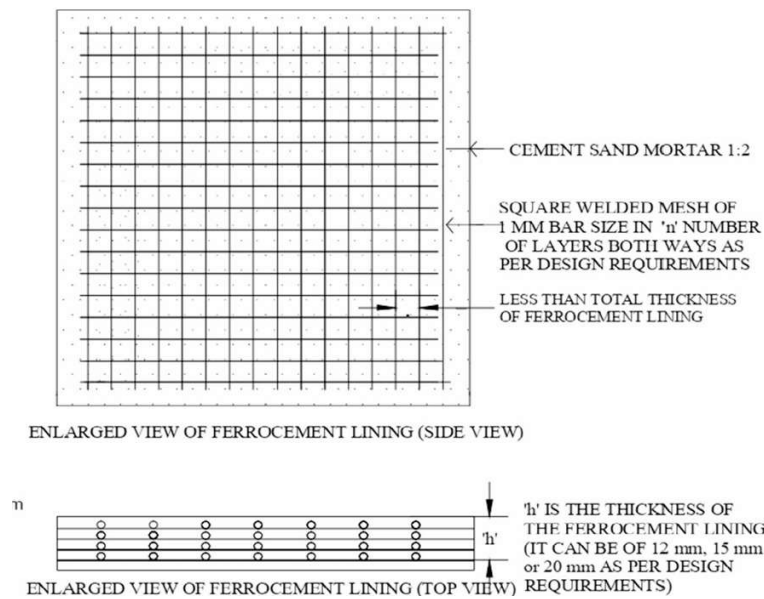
General ferrocement lining plan to be provided in tanks.
